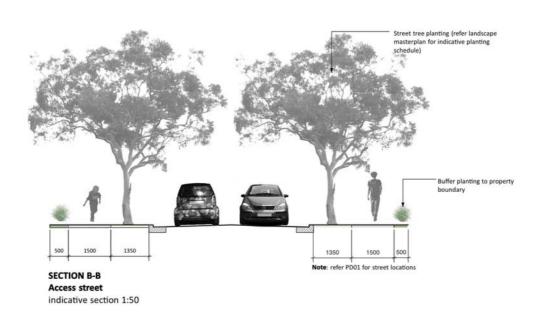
Typical Access Road (Road 4,8, 16) streetscape
